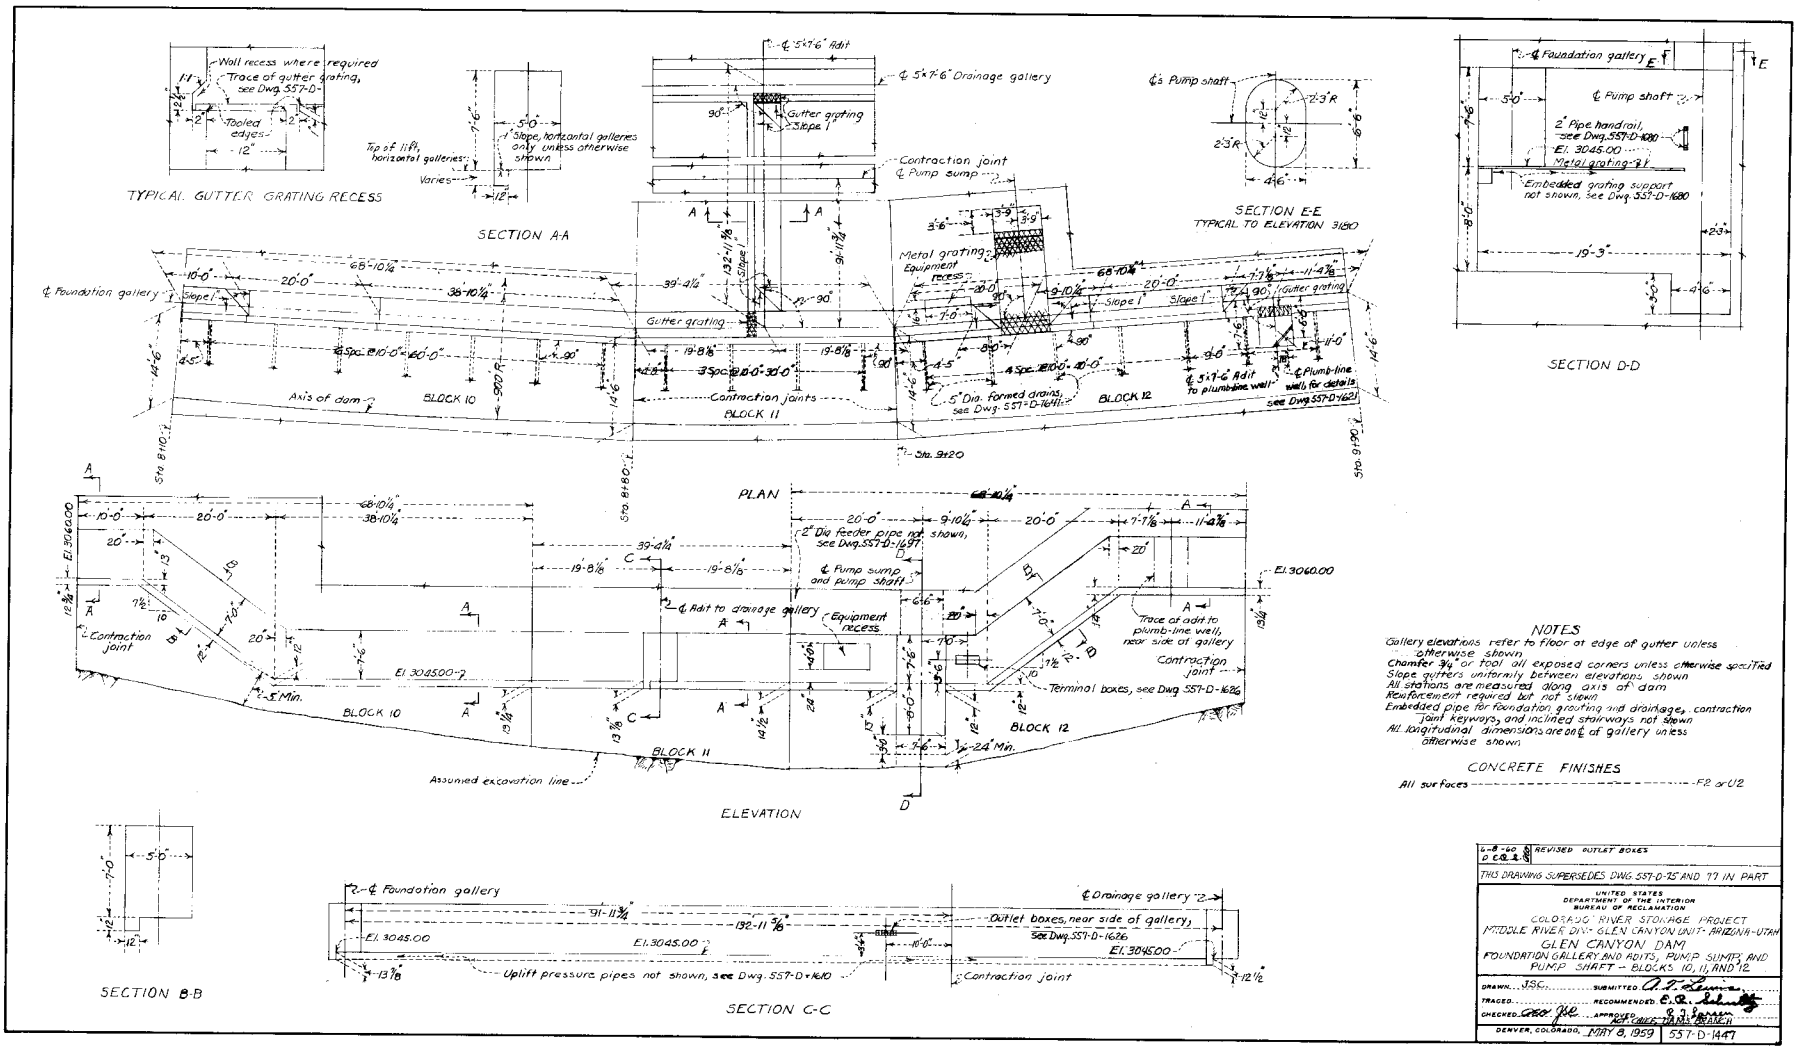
Dam foundation gallery and adits, pump sump, and pump shaft—Blocks 10, 11, and 12.
